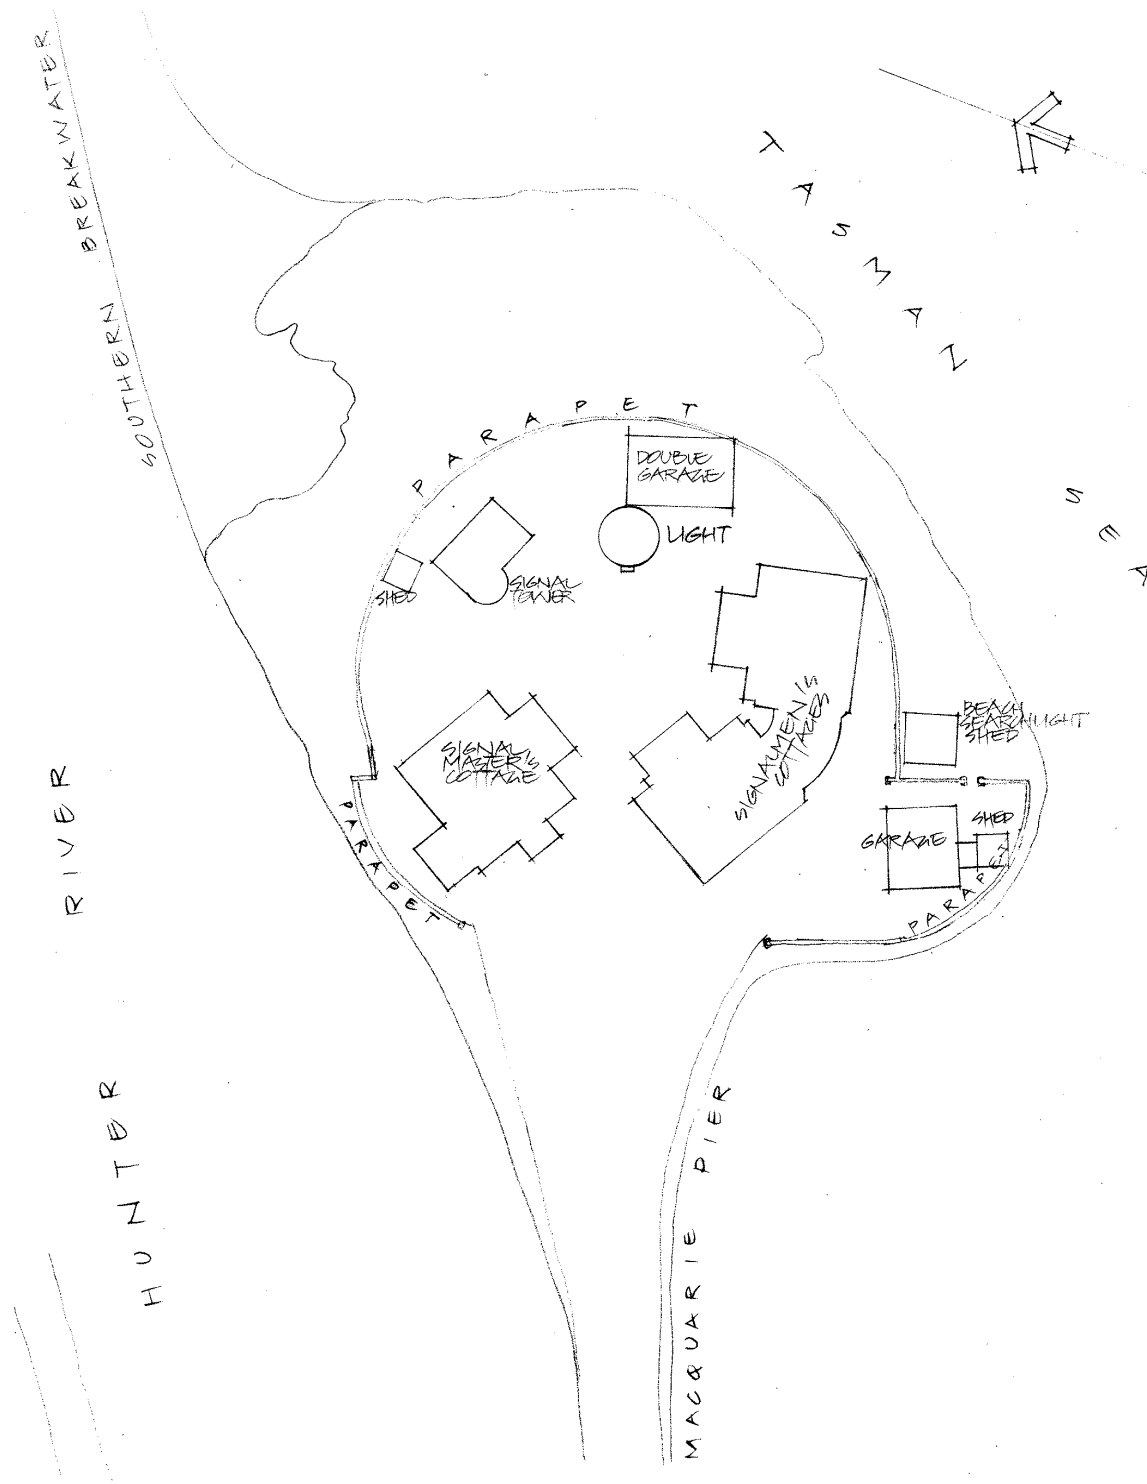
Site plan showing the current configuration of buildings and components. Not to scale. (Note: Some structures are present outside the line of the parapet which are not depicted here.)
